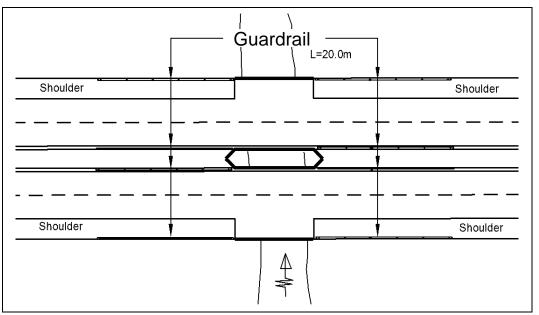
Plan of Guardrail at Approach of Bridge
